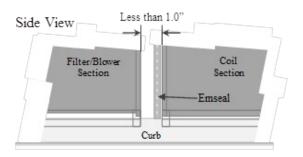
POSITIONED SECTION FASTENING BOLTS ▼
